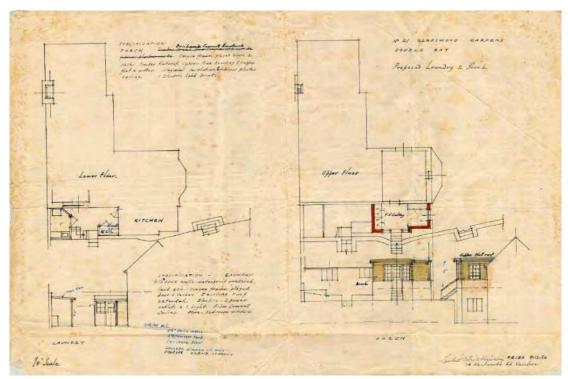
Plans from BA64/1951 (Source: Woollahra Records)
